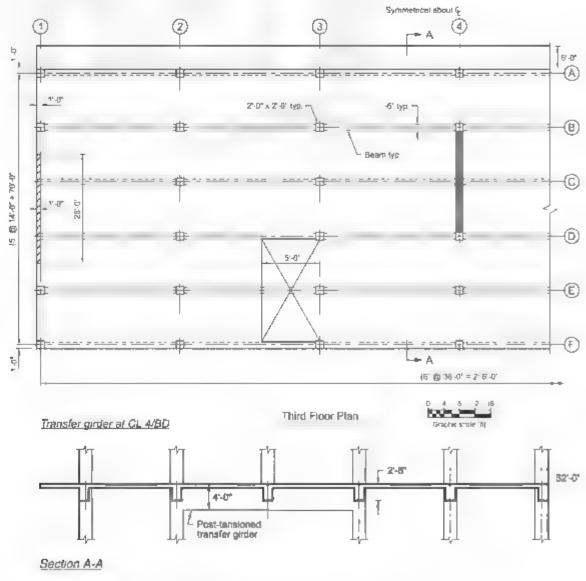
Plan and partial elevation of third level transfer girder and beams.
